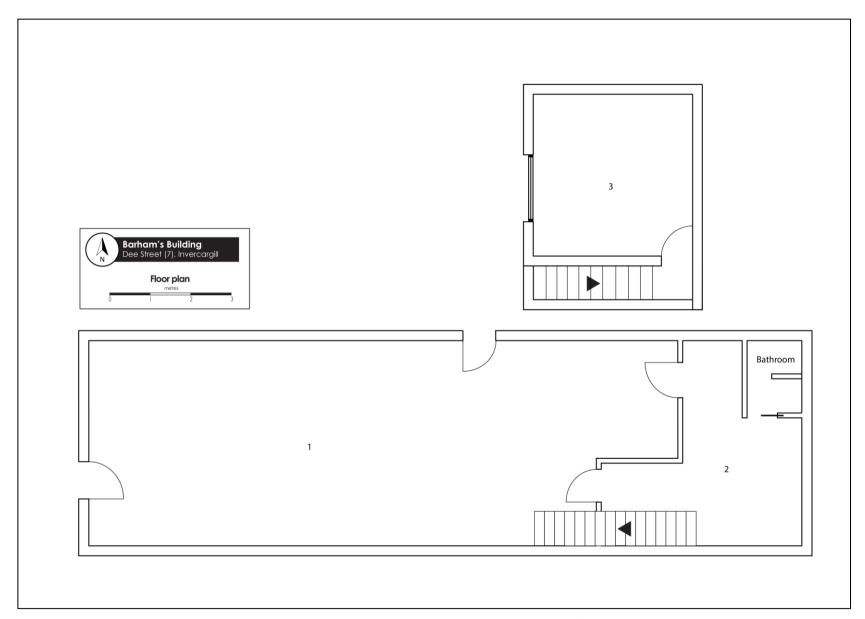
Ground (bottom) and first floor (top) plans of Barham's Building.
